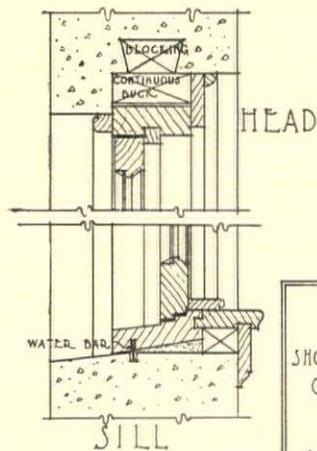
DETAIL "A" AN AUSTRAL WINDOW WITH PLASTER JAMBS SUITABLE FOR SCHOOLS OFFICE BUILDINGS ETC.
